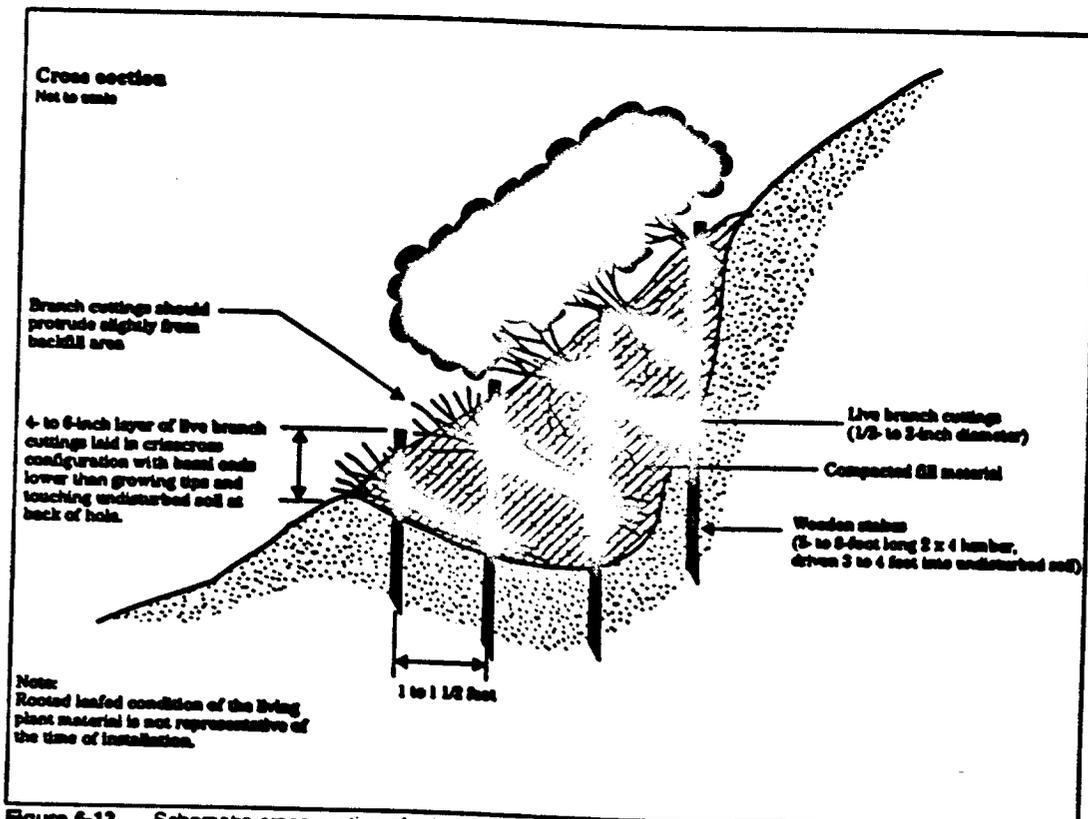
Schematic cross section of a branchpacking system showing important design details (USDA-SCS, 1992).
